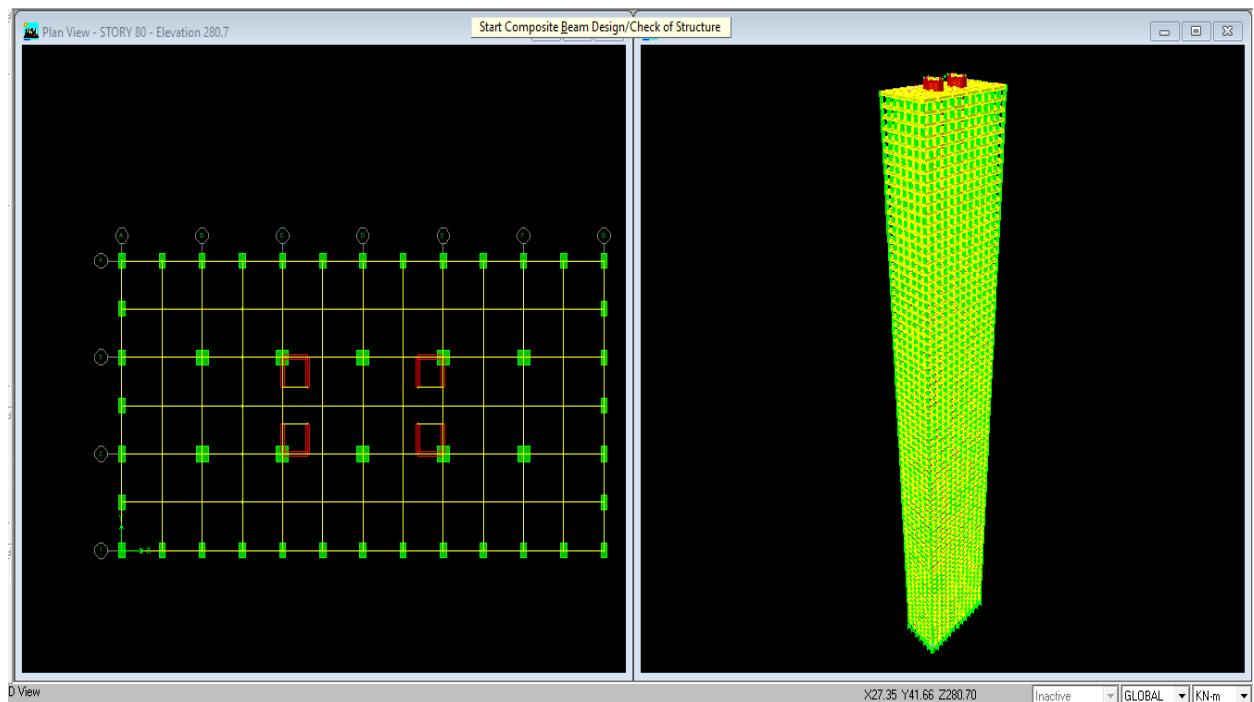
Plan view and 3-D view of 80 storied Framed Tube structure building
